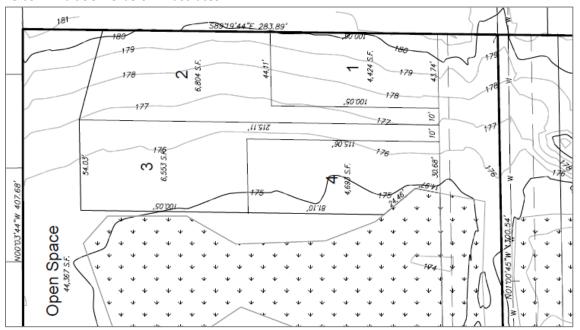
PRE 21-25 draft subdivision plan
